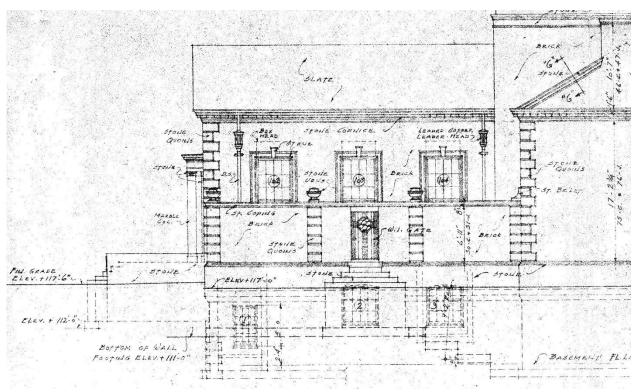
Excerpt of drawing sheet 6 prepared by architect Edwin H. Clark, April 1930, showing the east elevation of the east courtyard. Note the original wrought iron gate design.
